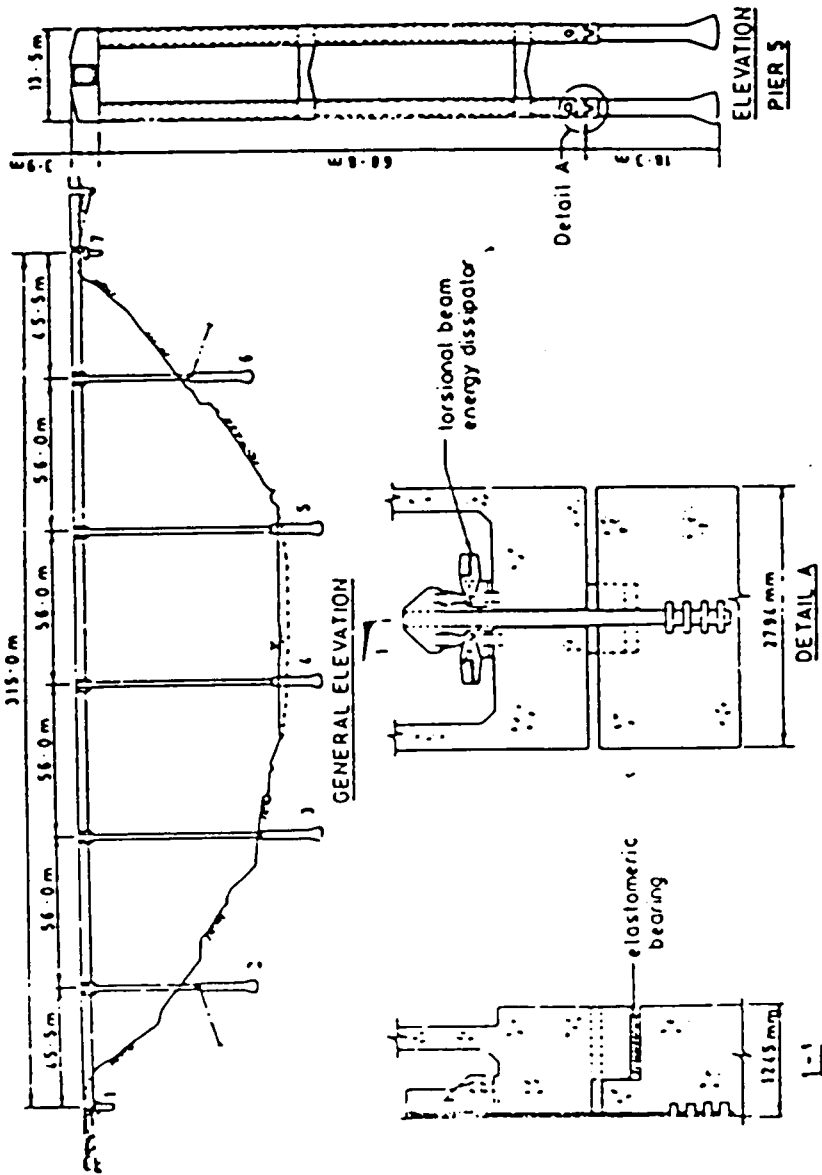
South Rangitikei, New Zealand Rail Bridge Construction[106].
